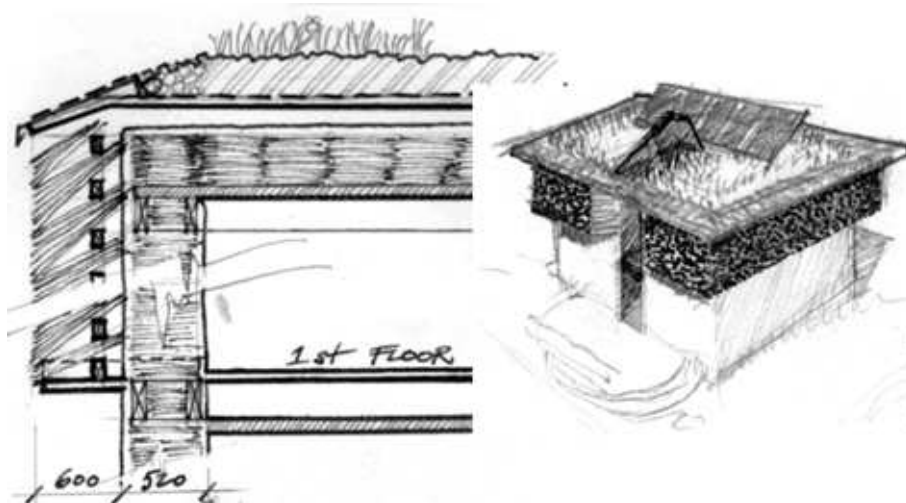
Section through the roof, ceiling and secondary story wall construction with a reed frieze. The reed is cut into 600mm long pieces and then tied in bundles onto a timber construction attached to an exterior of a second story external wall. Frieze adds a thermal insulation and is a protection against driving rain. It creates a necessary overhang and protects the wall below.
